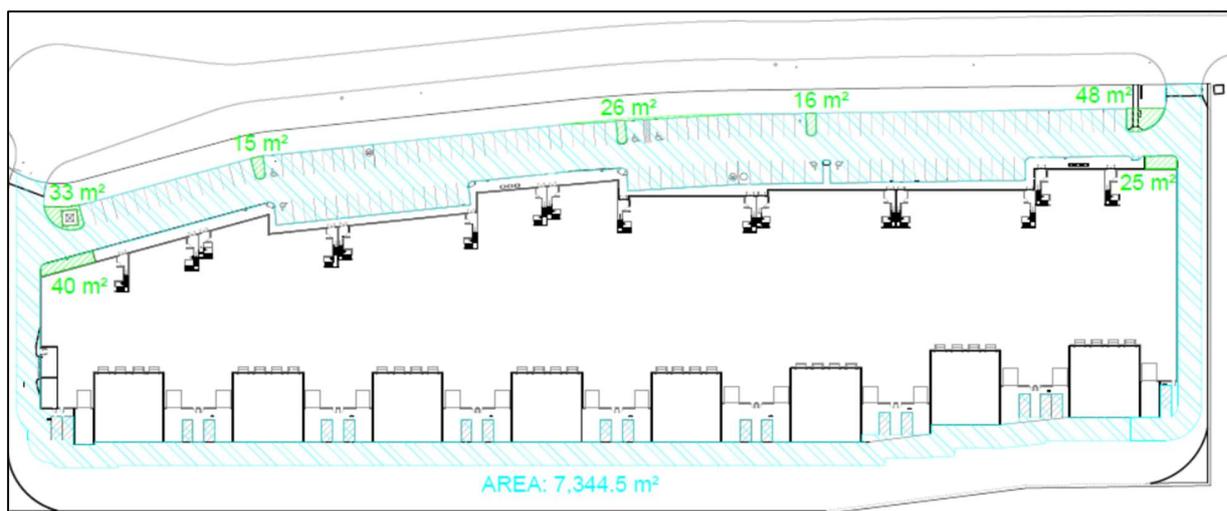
Site Plan showing agreed upon Parking Lot Area and Parking Lot Landscaping.
